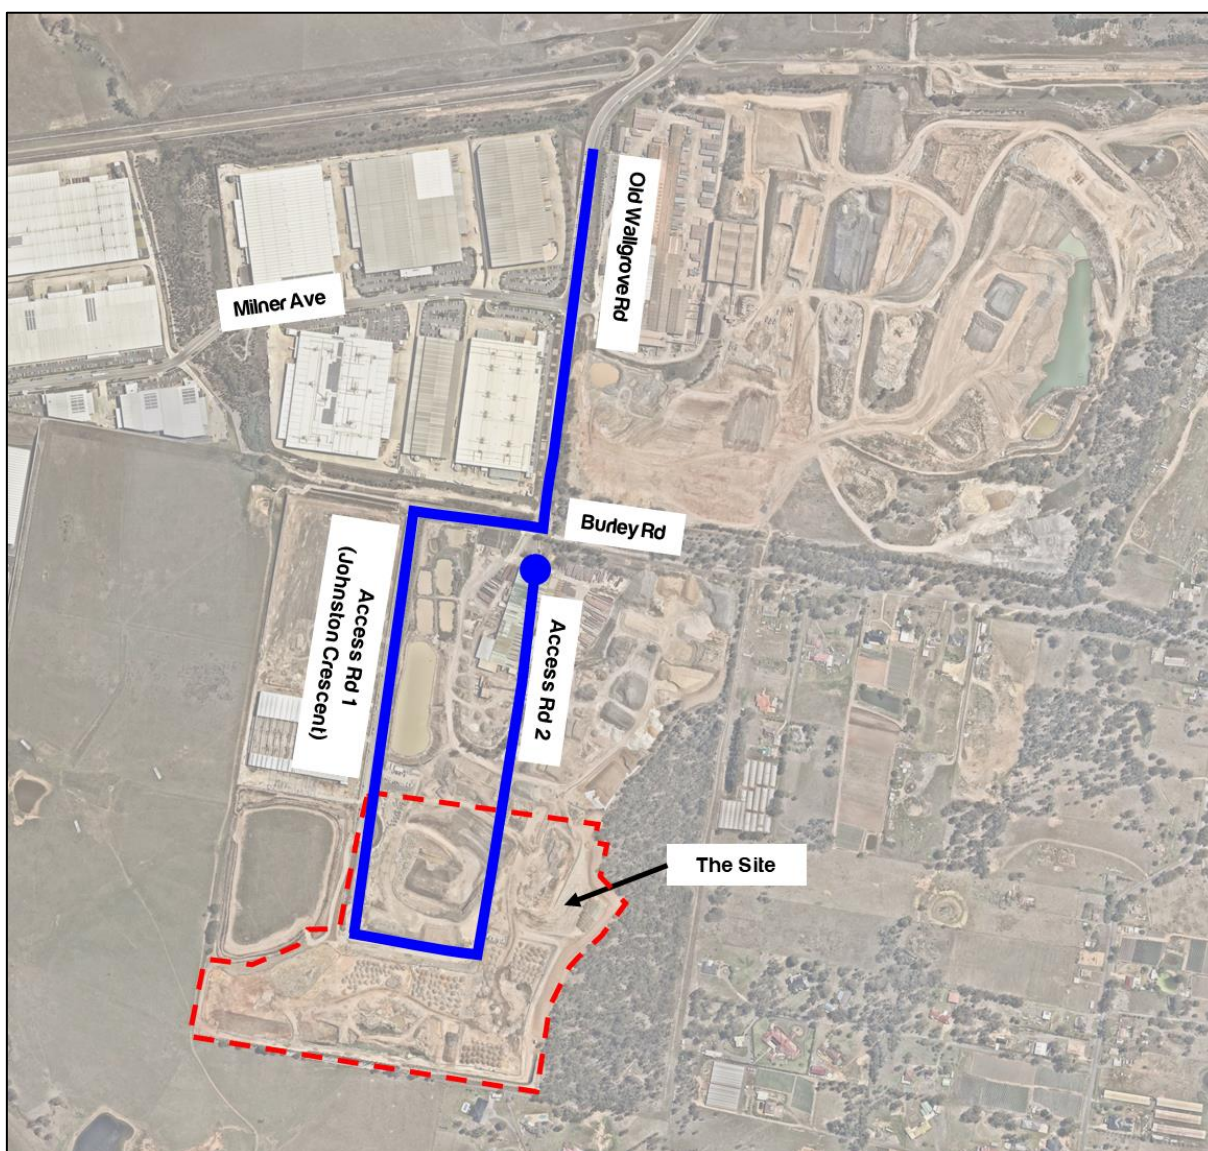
Stage 2 Indicative Road and Intersection Arrangements
